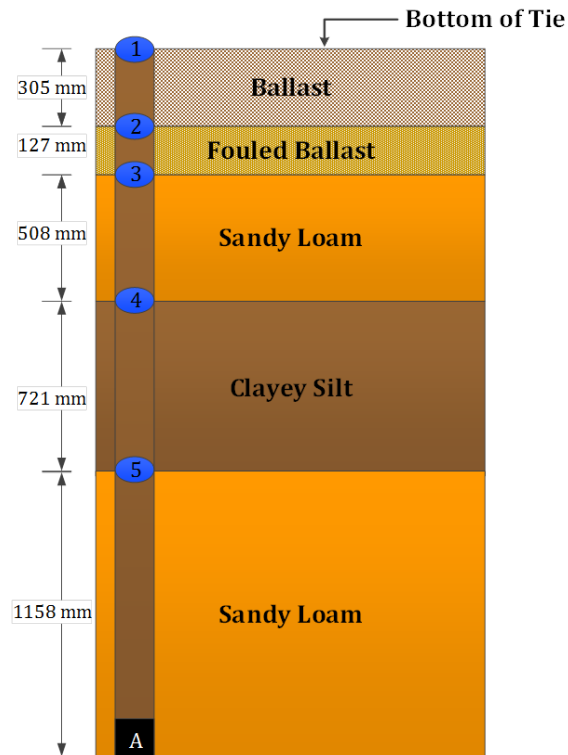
Substructure Layer Profile for Upland Street 60 ft From the North Abutment (Track 3)
